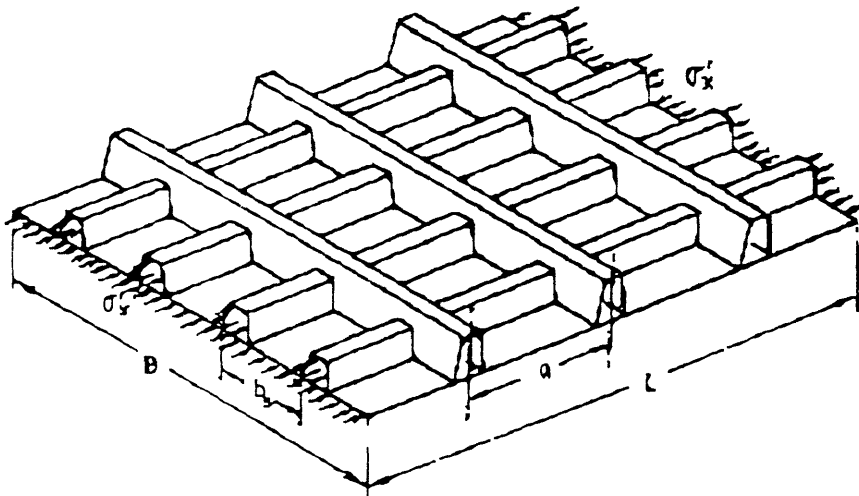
Stiffened plate with transverse and longitudinal stiffeners.
